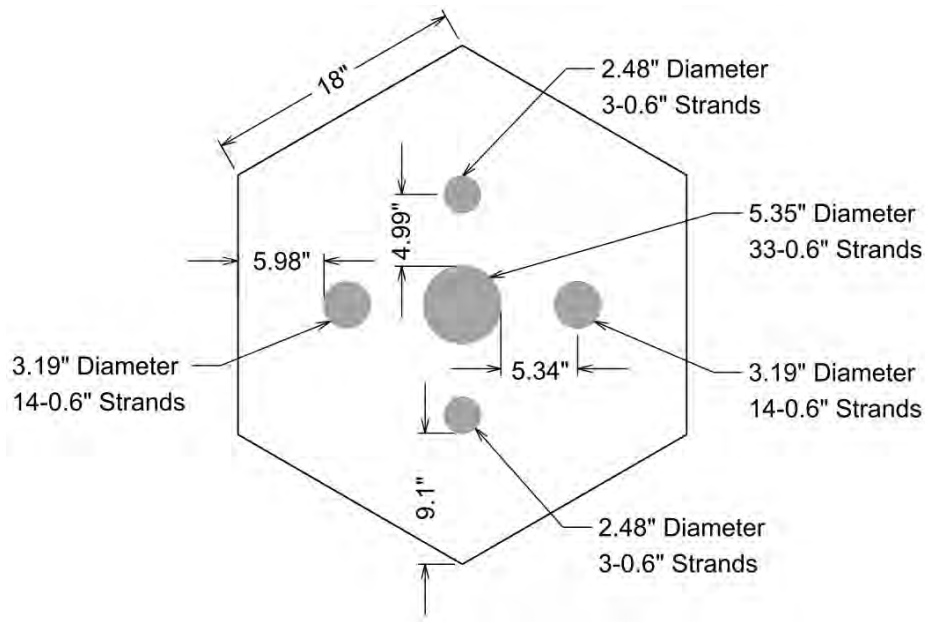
HSC Column Cross-Section at the Base of the Tower
